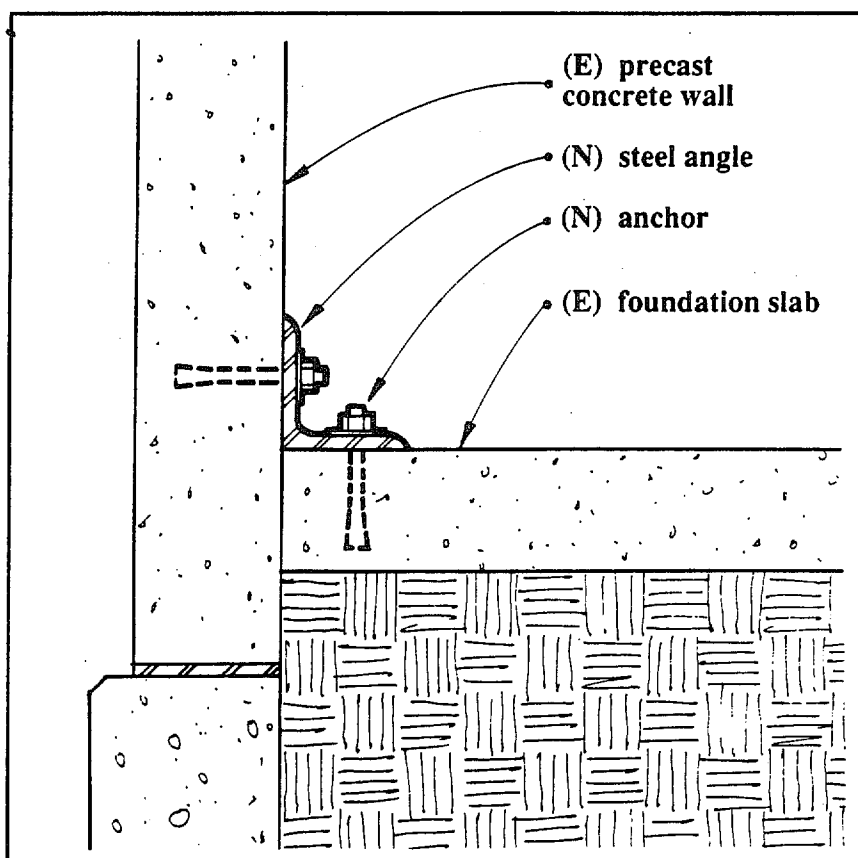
Strengthening of a precast concrete wall to foundation connection.
